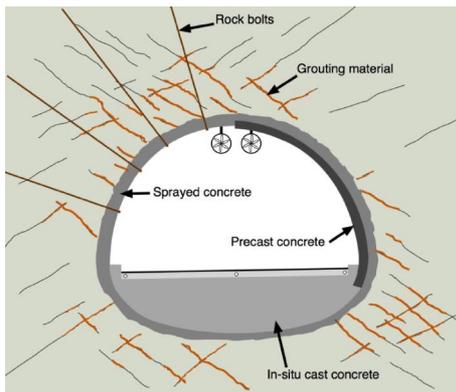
Example for a rock support system in tunnels based on steel rock bolts, grouting the surrounding fractured bedrock and linings of sprayed and/or casted/pre-cast concrete. Illustrations from [15].
